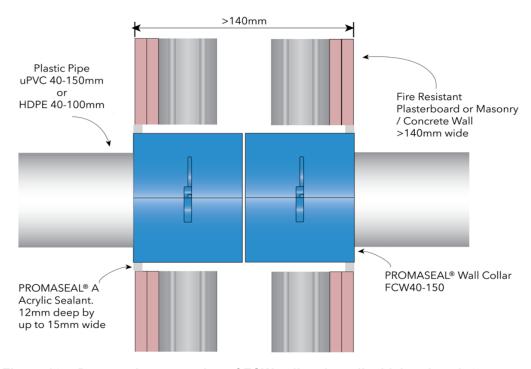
Proposed construction of FCW collars in walls thicker than 140 mm
